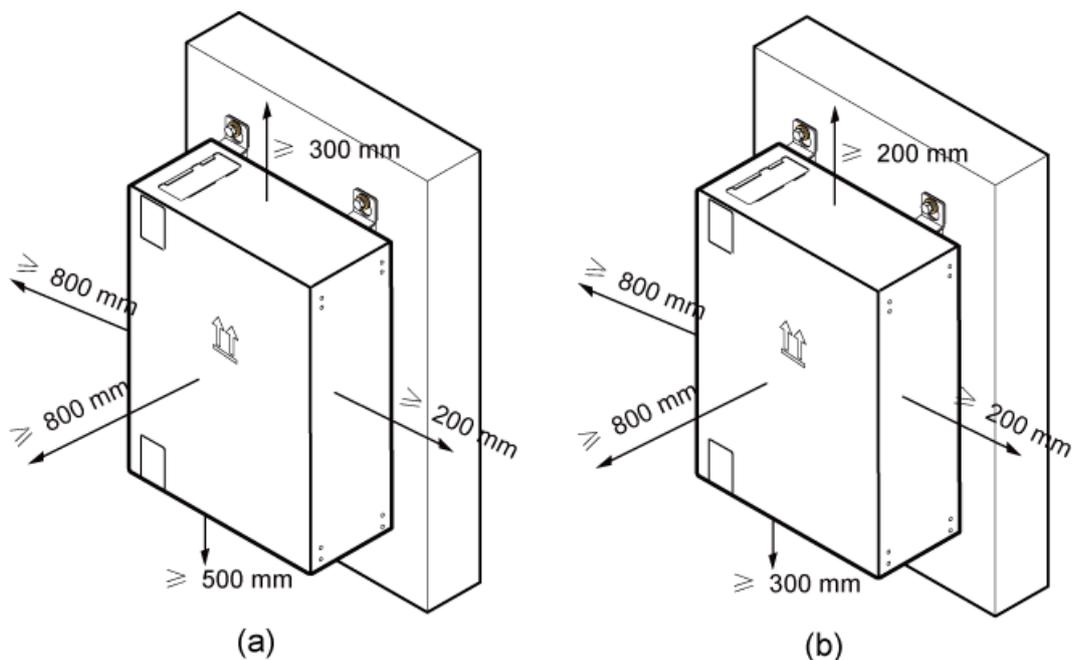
Installation clearance requirements for the IMB03 right-side-mounted on the wall
